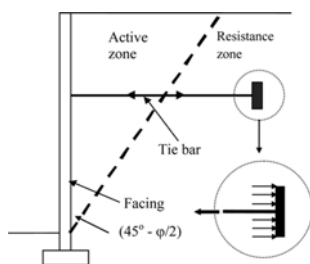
Reinforcing Mechanism in Anchored Earth Wall
